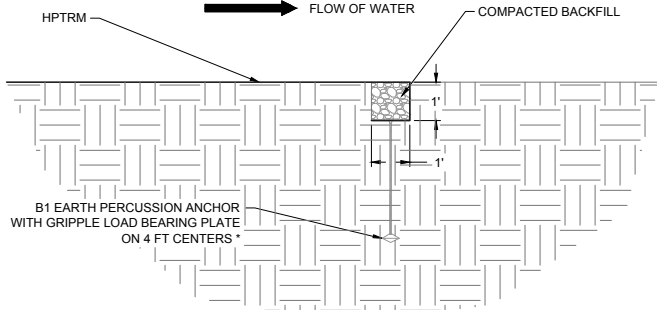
INITIAL CHANNEL ANCHOR TRENCH (DOWNSTREAM) DETAIL
